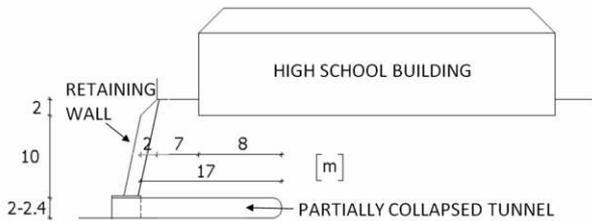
Schematic cross-section of highschool building with position of collapsed tunnels.
